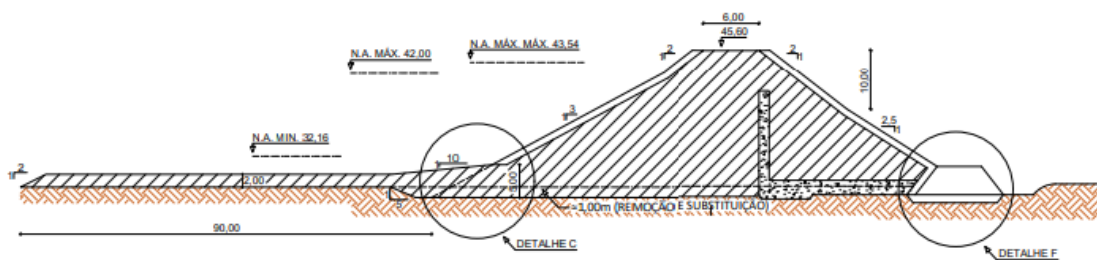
Typical cross-section between elevations 26 and 32 m [1, 7]
